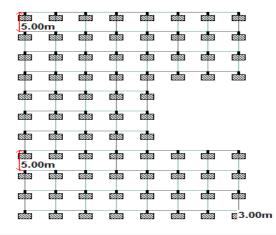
Plan of 10,20,30 storey multi-storeyed building
